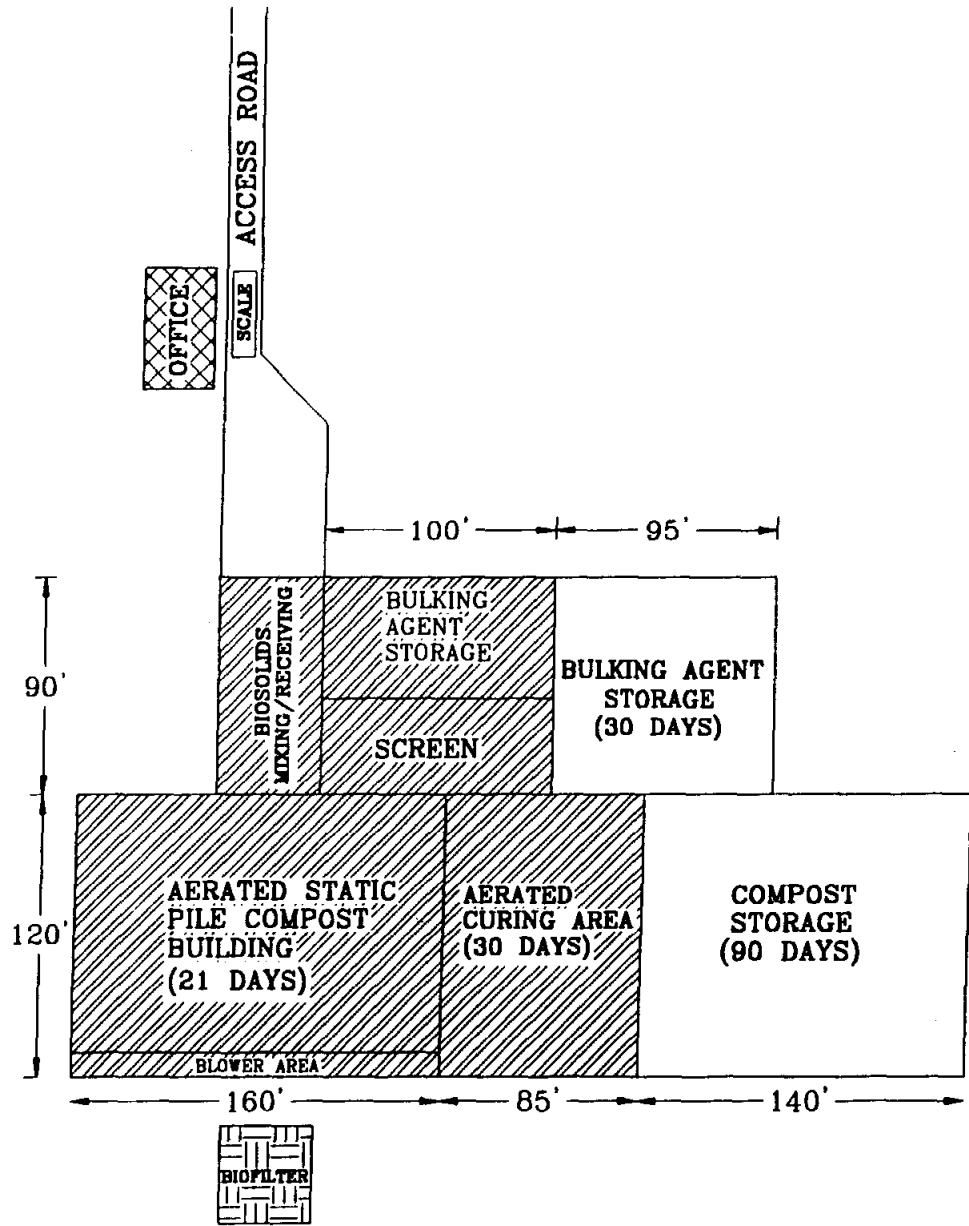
FACILITY LAYOUT - AERATED STATIC PILE 7.5 DTPD
